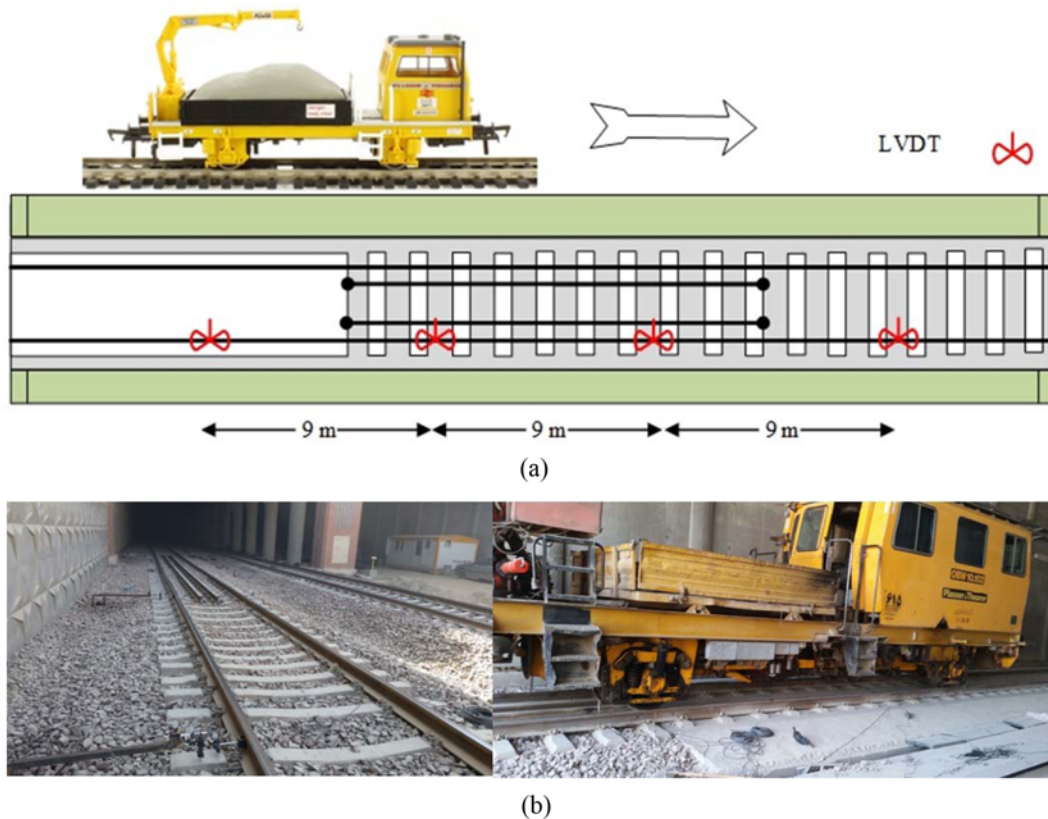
Experimental Test Along the Combined Transition Zone: (a) Test Plan, (b) Measurement Campaign
